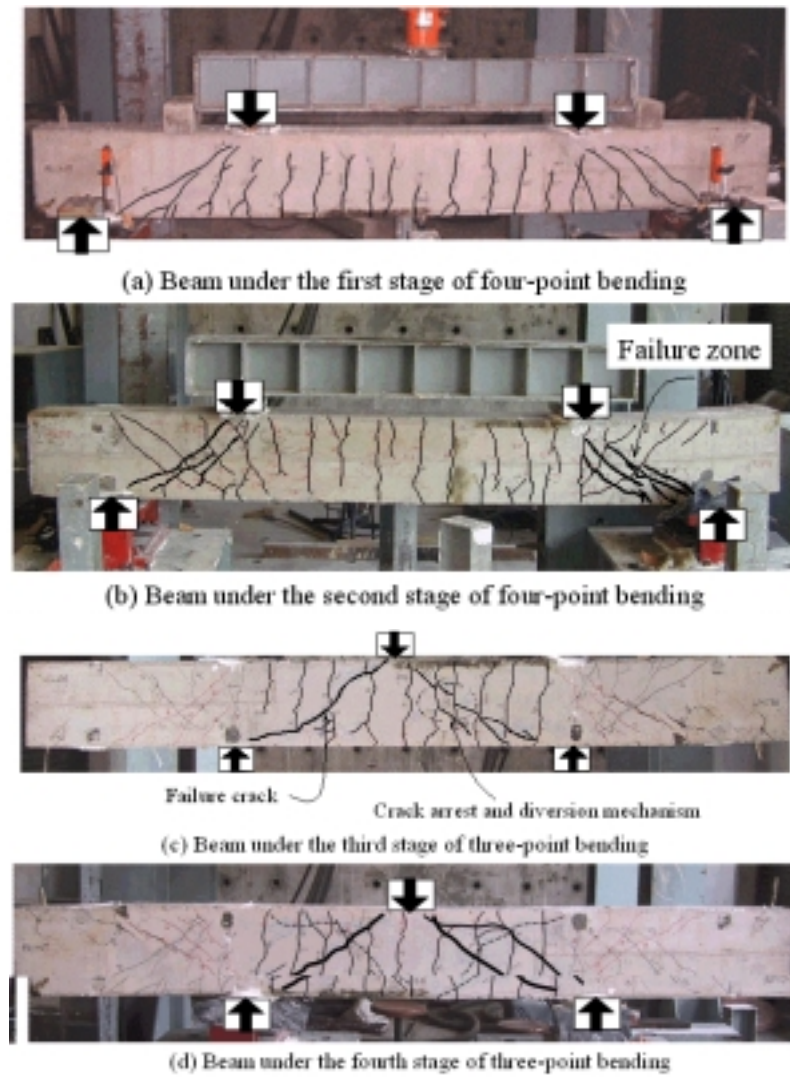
Crack pattern observed in each loading stage for a typical beam
